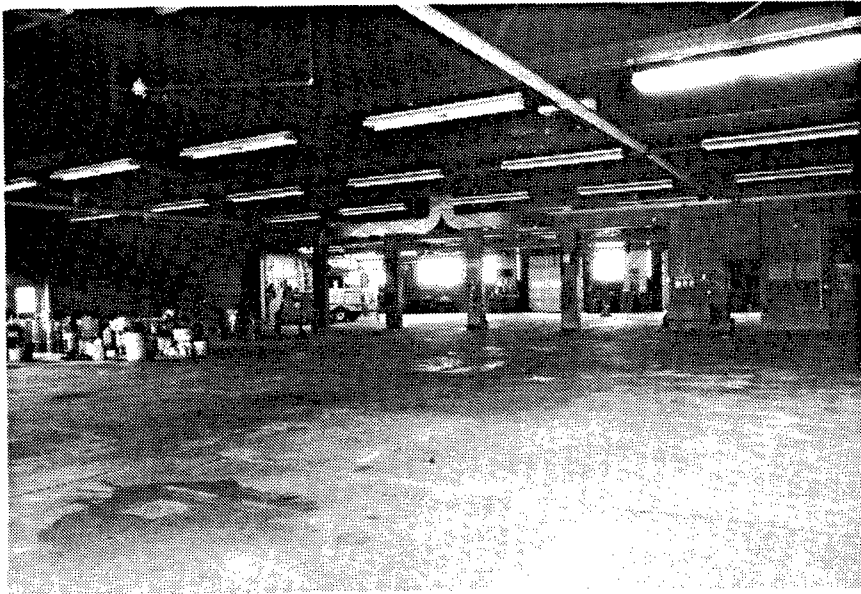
Building 114: Interior view of the Railroad and Vehicle Garage.
